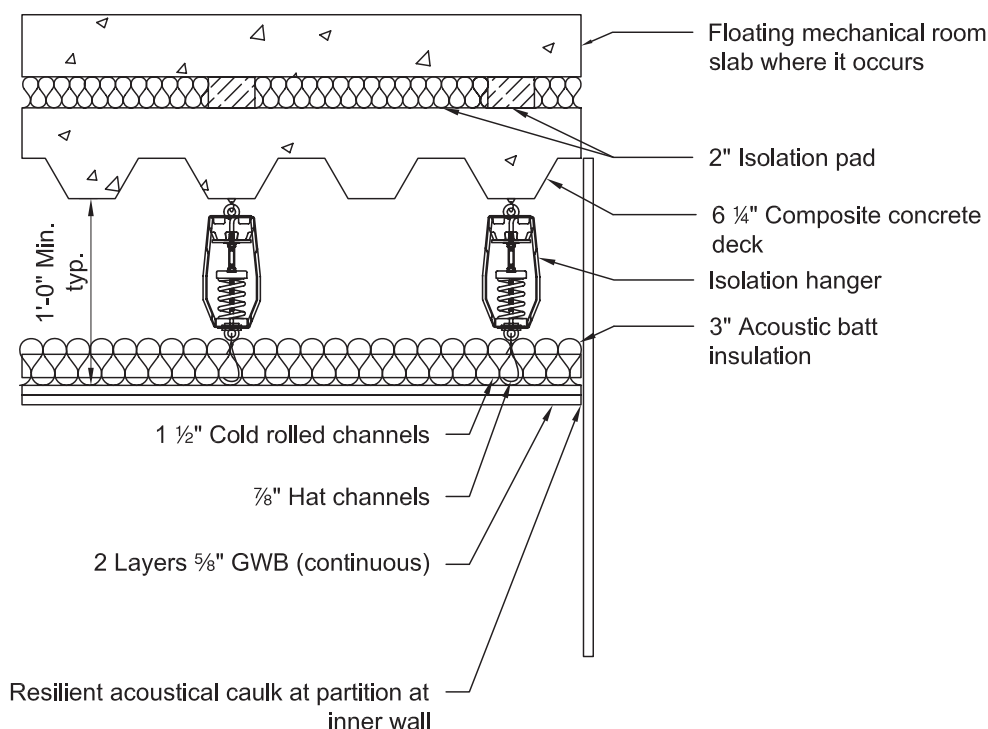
Composite metal/concrete deck with spring ceiling hangers and resiliently floating concrete floor.
